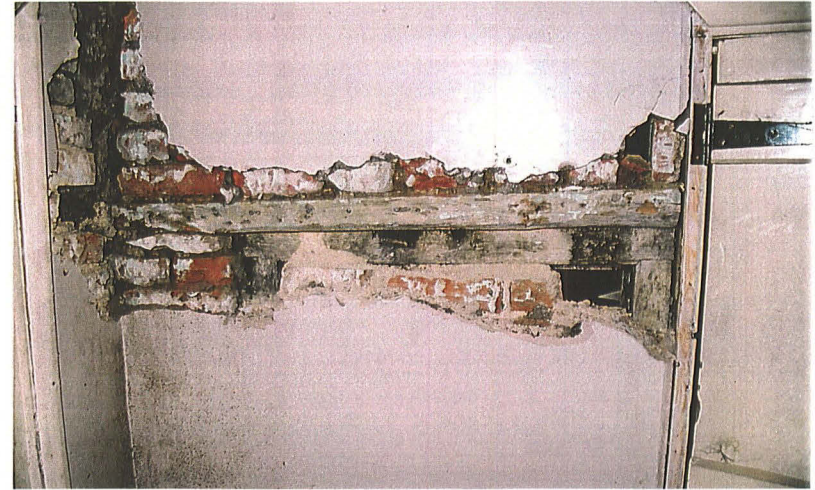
Room D, north wall, wooden rail/lintel over pegged doorframe
